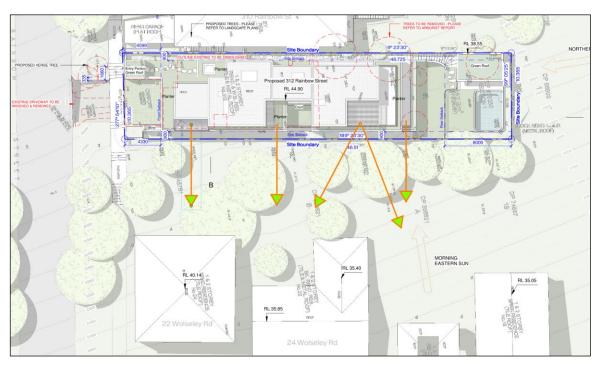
Demonstration of potential visual privacy impacts of adjoining properties on Wolseley Road (arrows)
